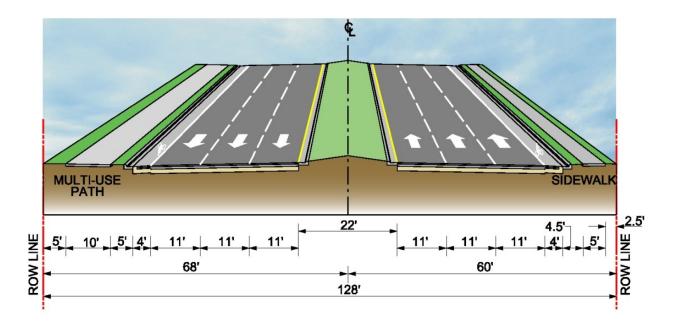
SIX-LANE DIVIDED URBAN TYPICAL SECTION FORT KING ROAD TO US 301
